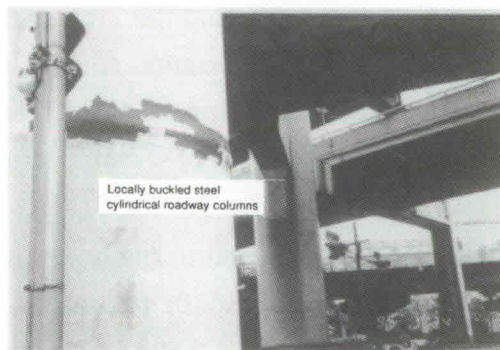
Locally buckled hollow cylindrical roadway columns at a junction
